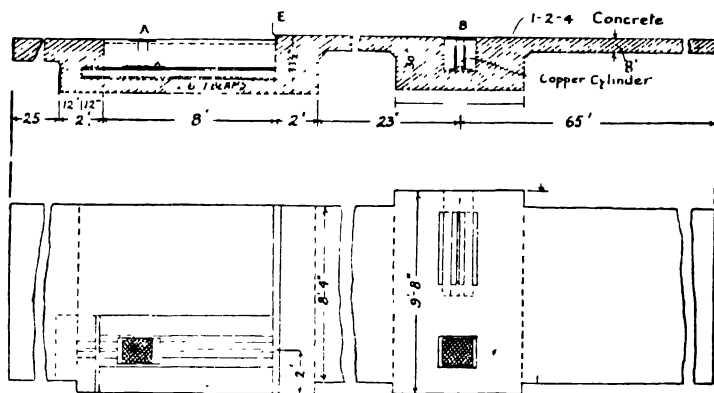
Section showing Special Concrete Road Construction and Apparatus for Impact Tests (U.S.A.).
